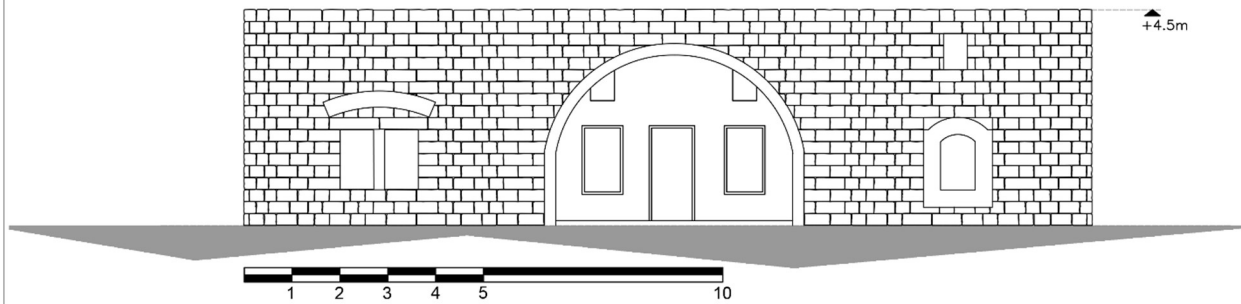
(a) Northeast Technical Elevation of Flat Mokhtara Flat Roof Liwan House, Source: Author
